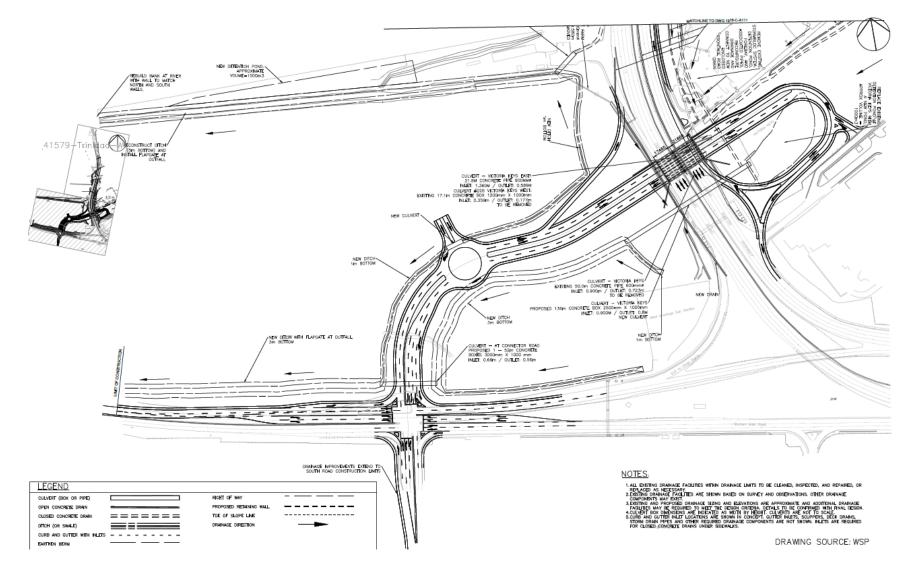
Key Component 5 Road and Drainage Layout Pt 2
